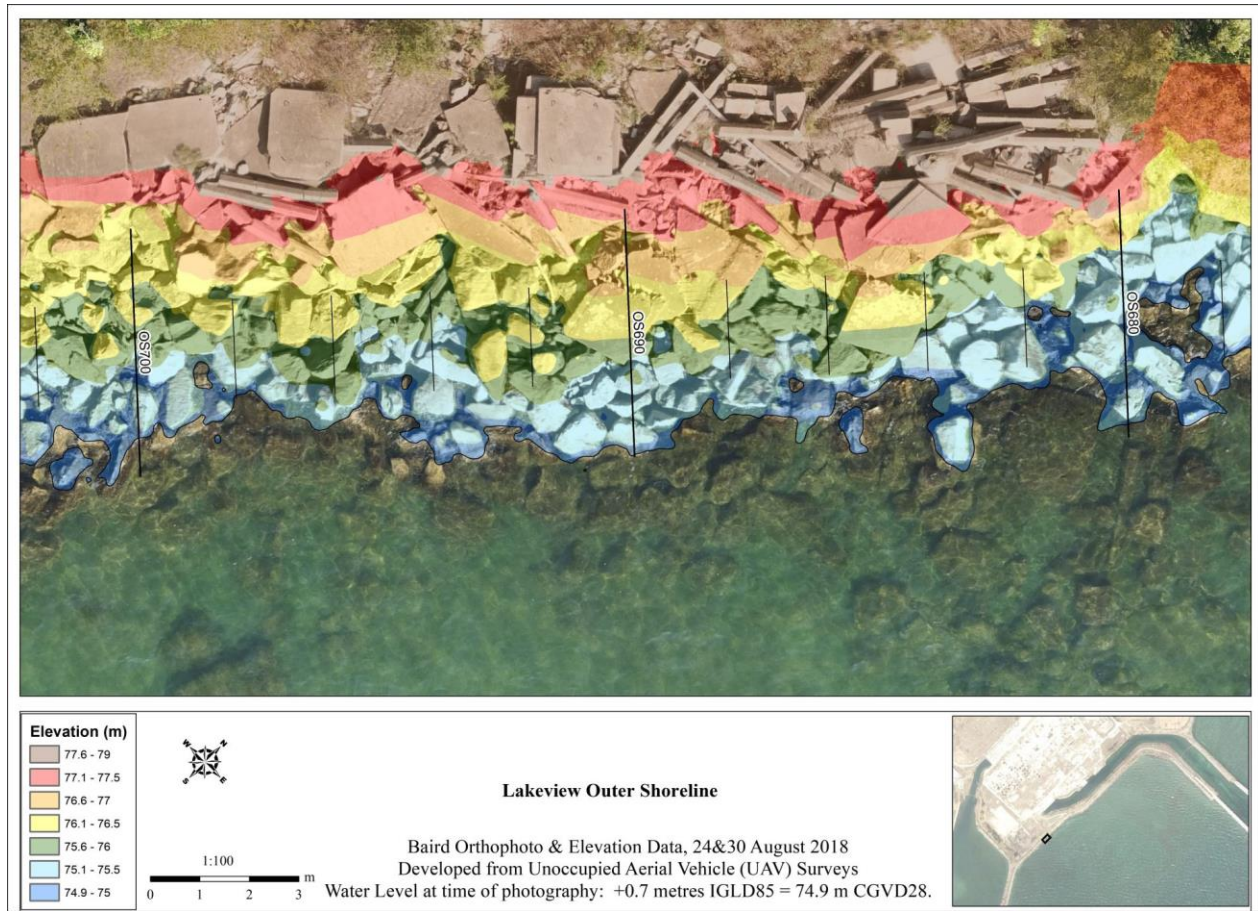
Example of surface elevations of Outer Shore revetment (OS680 to OS700)
